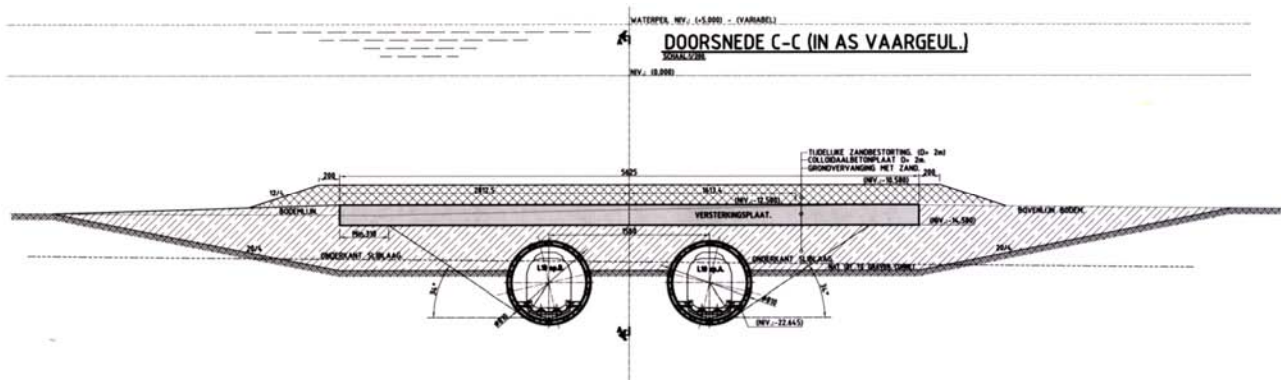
Cross-section through harbour canal with stabilising concrete slab
